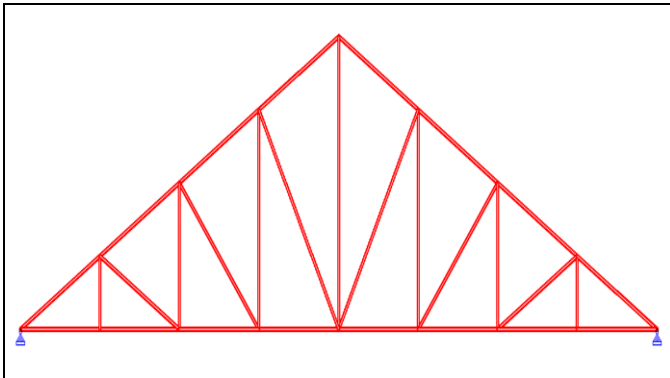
(Front View) 2-D Line Plan of Industrial Warehouse Pratt Roof Truss.
